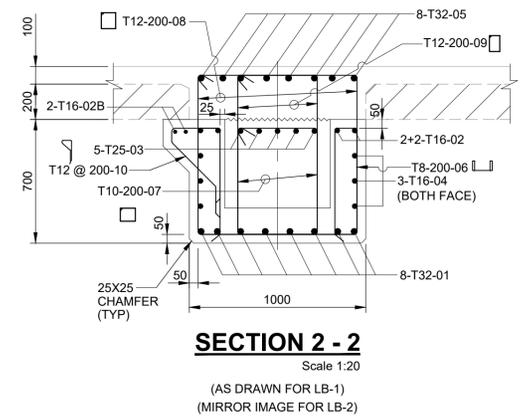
DETAILS OF LONGITUDINAL BEAM LB-1 & LB-2
